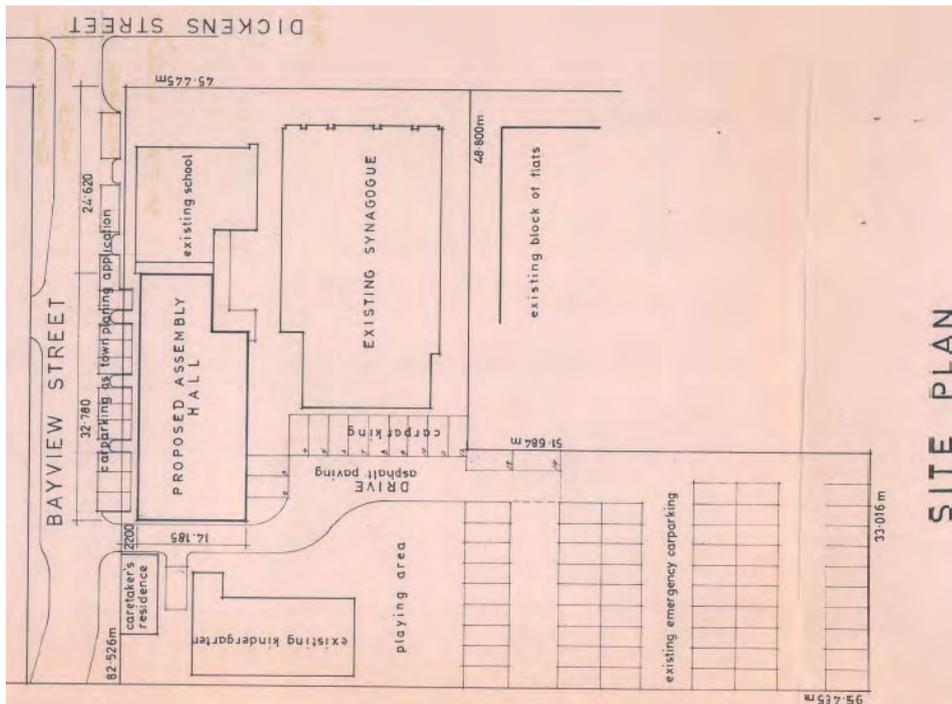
Drawing related to building permit 7845. Site plan (Nicholas Katris & Assoc. June 1979) (Source: Council Building File)
